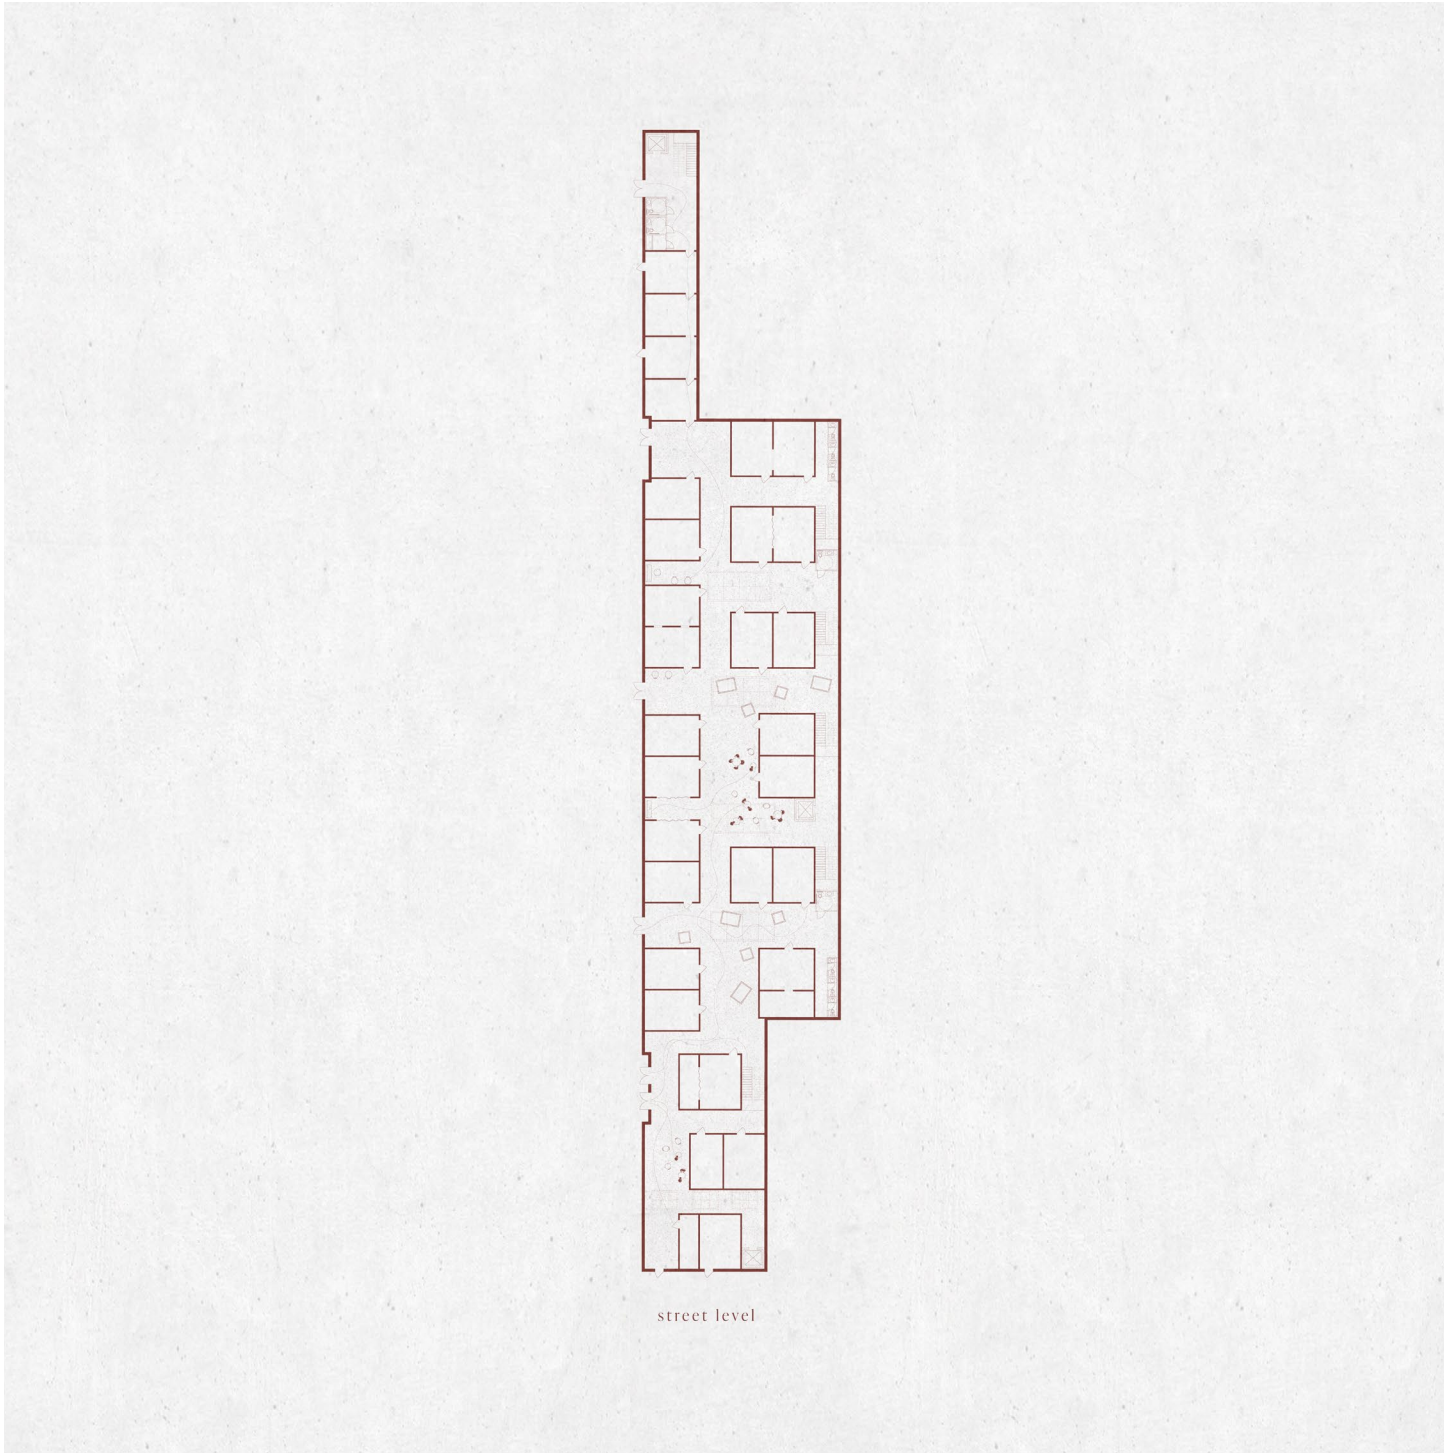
Street level floorplan, including existing building envelope with new businesses and public spaces inserted.
